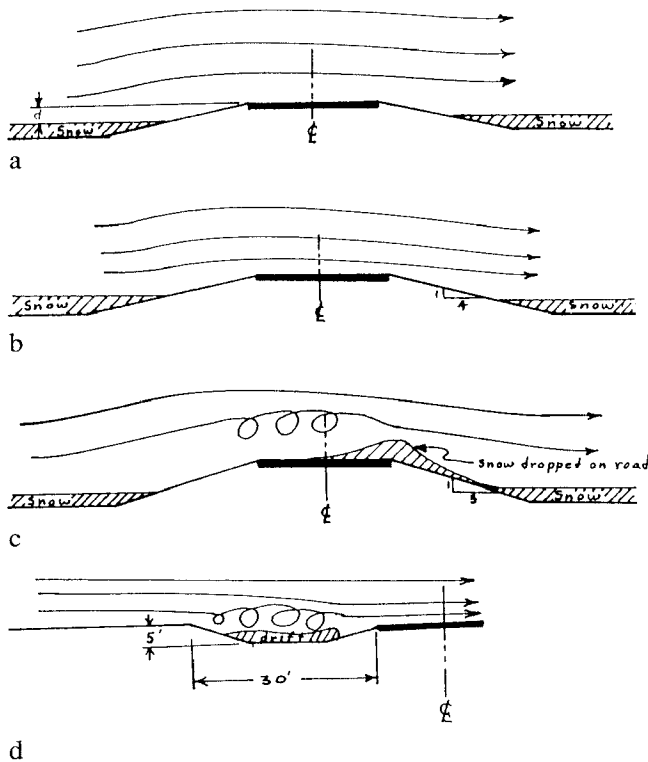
Maine DOT's illustrations of the effect on highway profile and typical section on snow drifting (38). (a) Profile and typical section. (b) Flat side slopes reduce drifting. (c) Steeper slopes increase drifting. (d) Cut side sections on windward sides reduce drifting.
